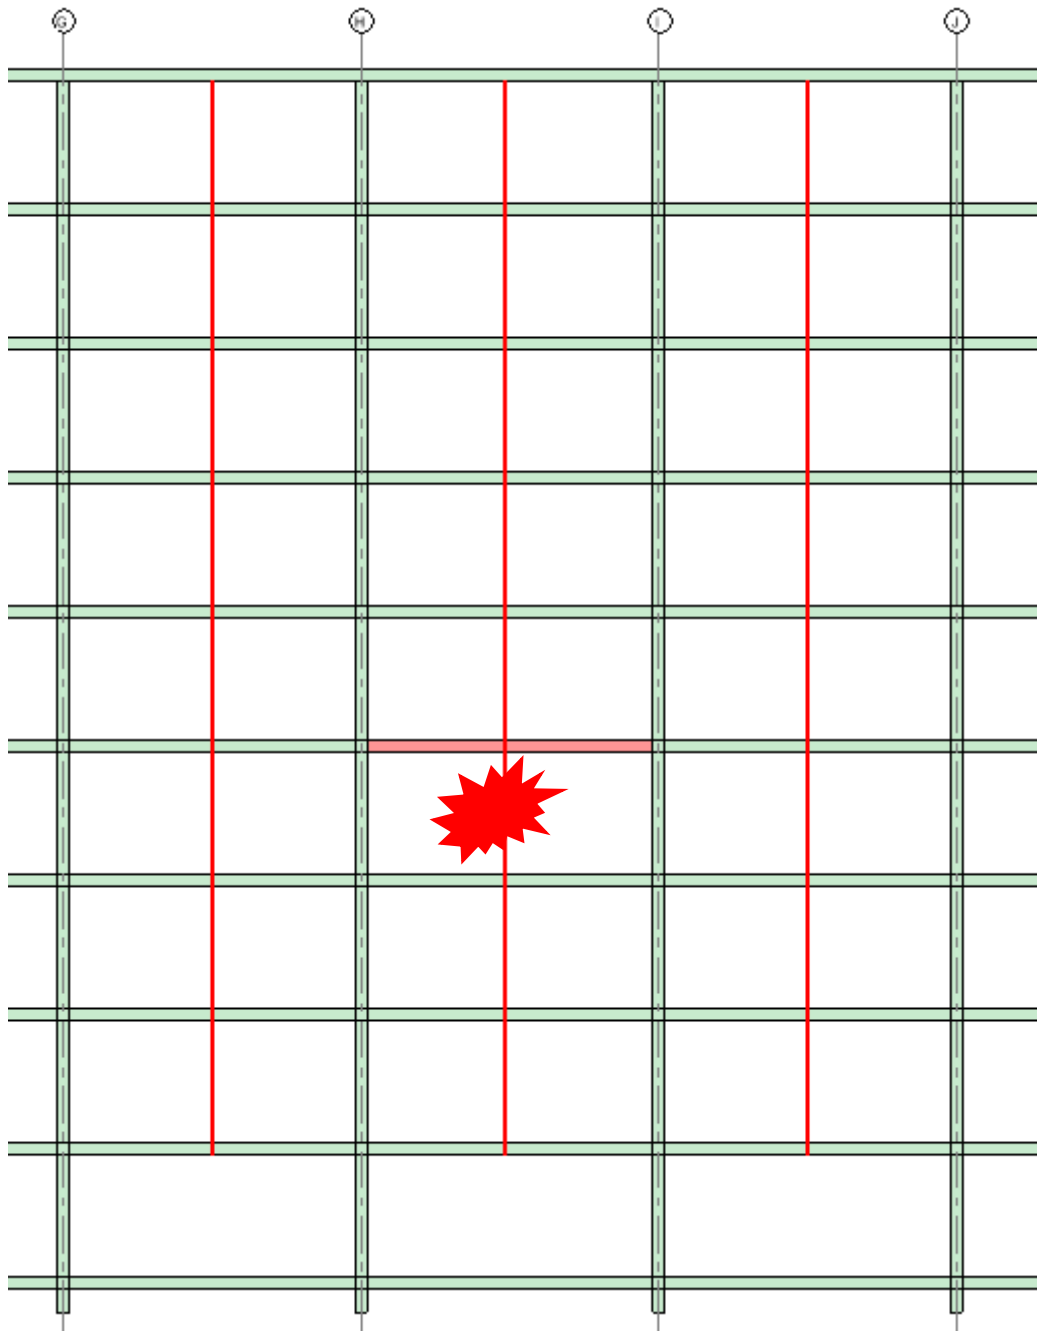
Collapse mechanism if fire event occurs within an internal flat, Haviland & John Cozens house (elevation)
